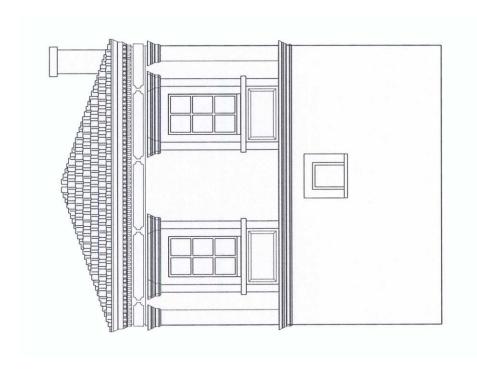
Left Elevation of 39-Türkkuyusu Street Scale: 1/75
